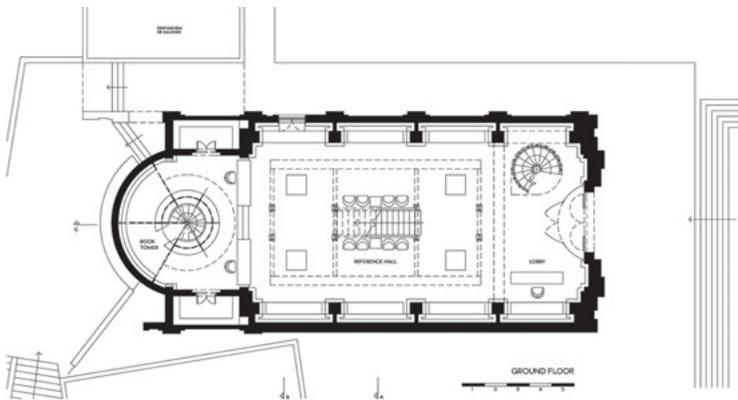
Plan of ground floor level. © Carlos Campuzano Arquitectos.
